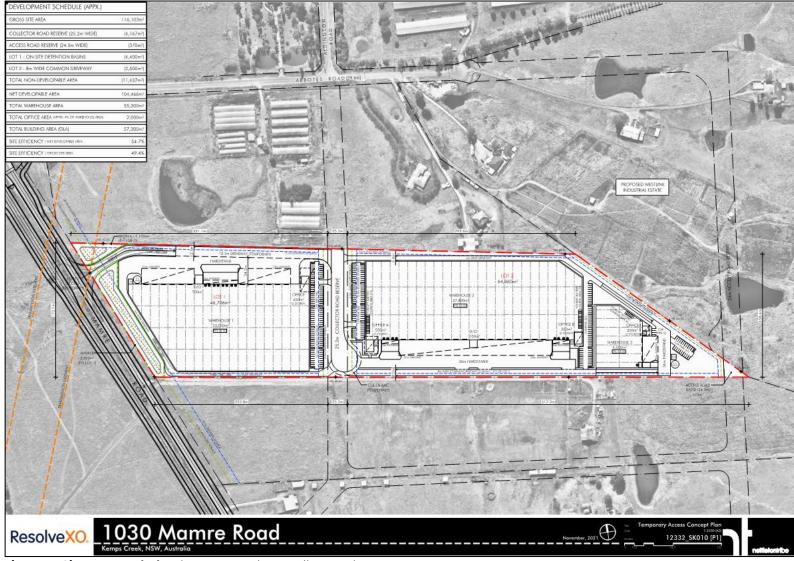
Site Proposal Plan (Source: Nettleton Tribe, 2021)
